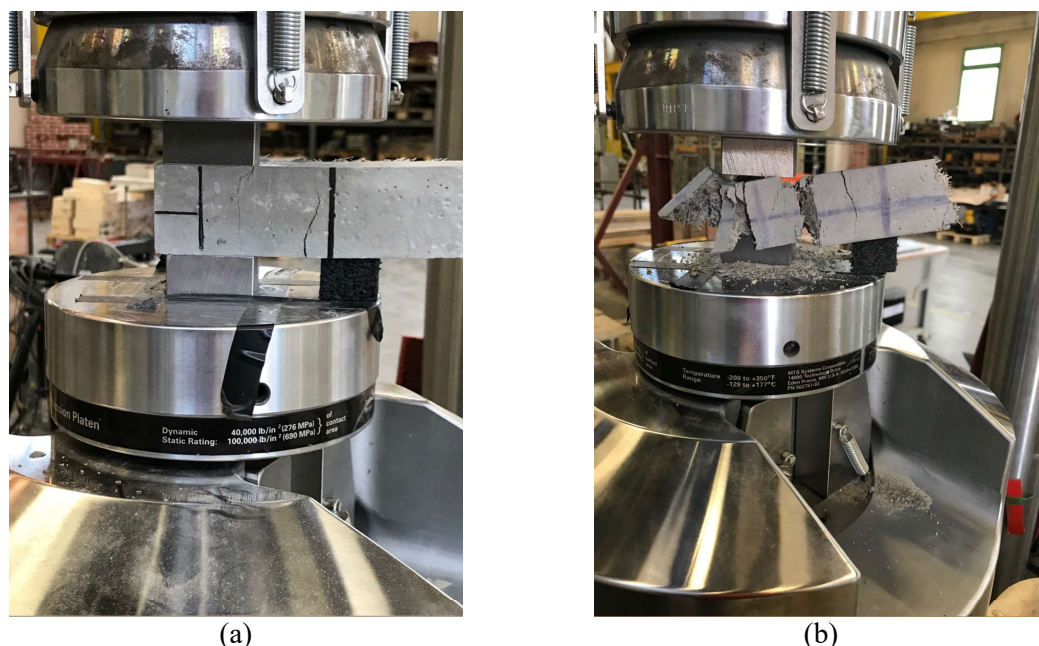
Compressive tests performed on (a) both end of the prismatic specimens; (b) Failure of the sample under compressive load.
